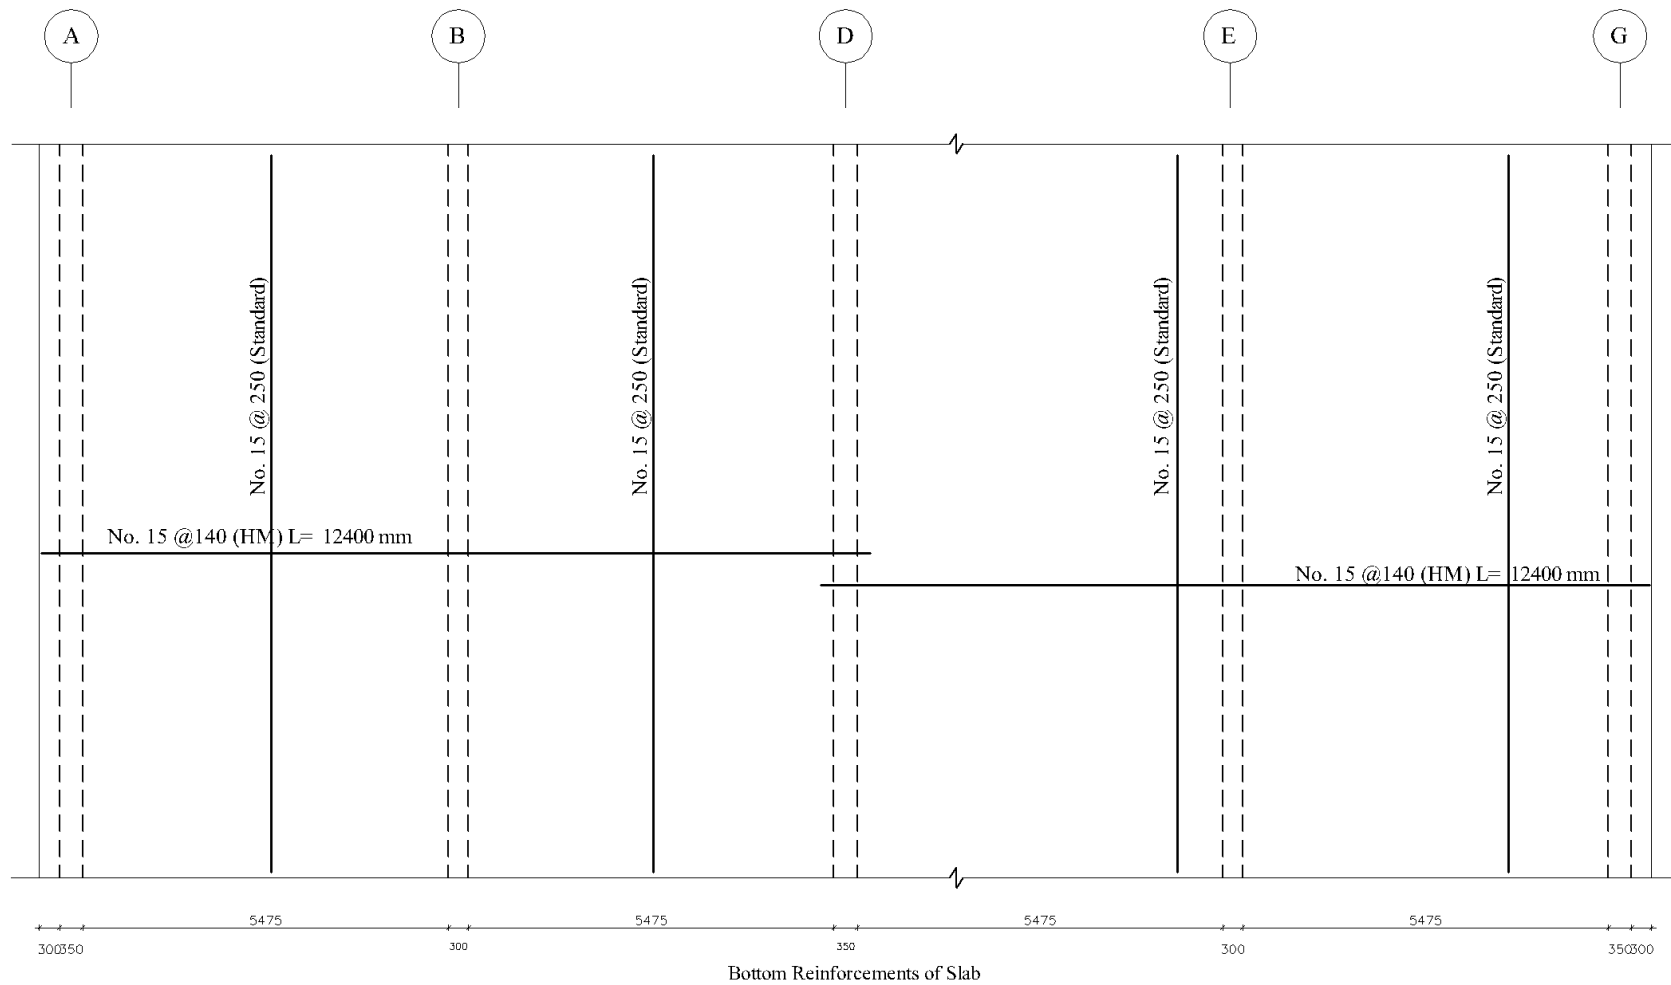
Details of bottom reinforcements of the slab (Plane)
